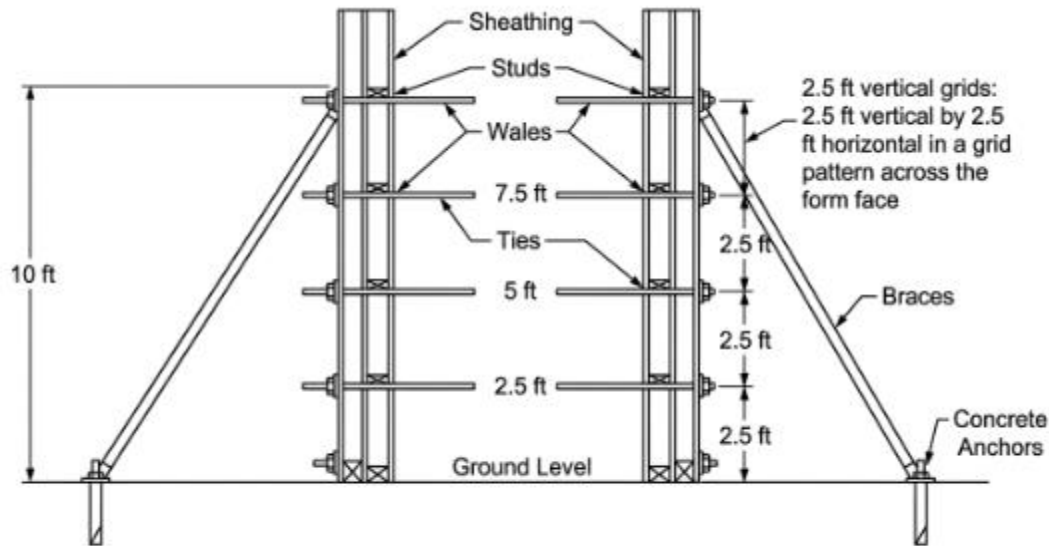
Cross-section diagram of a wall formwork system showing vertical wales, horizontal form ties spaced at regular intervals, and diagonal bracing struts extending from the top of the form down to concrete anchors in the ground.
